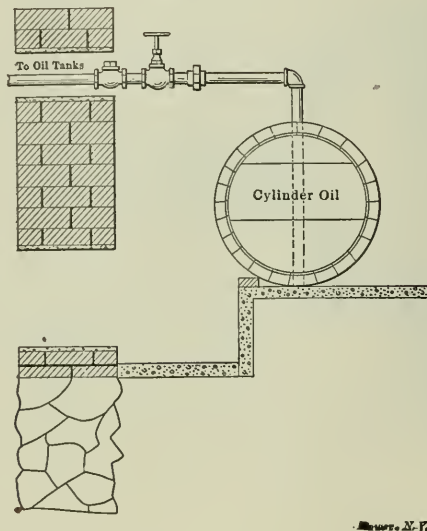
METHOD OF GETTING OIL INTO STORAGE TANK
